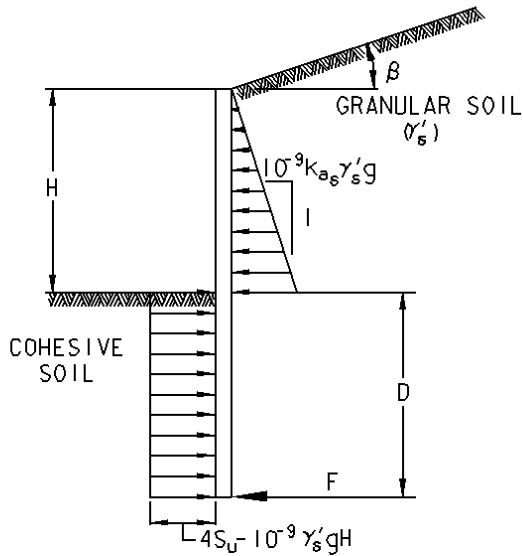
Simplified Earth Pressure Distributions for Temporary Nongravity Cantilevered Walls with Discrete Vertical Wall Elements
